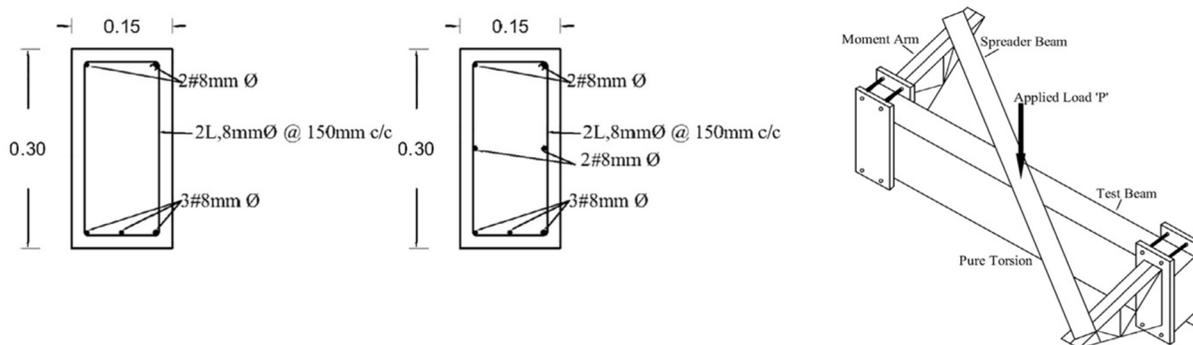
Dimension and detailed of tested beam by Sachin B. K. and Rajshekhar S. T, (2021)
